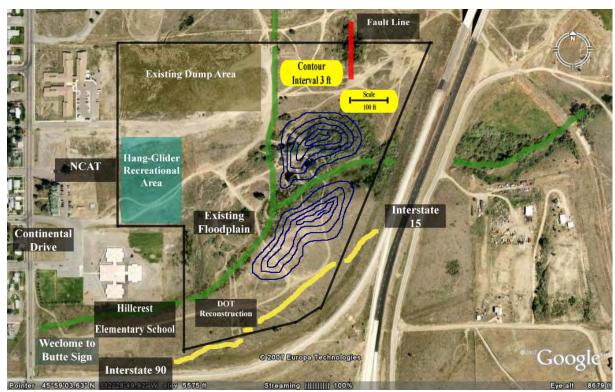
NCAT Pond Design—Two pond locations for the NCAT site.
